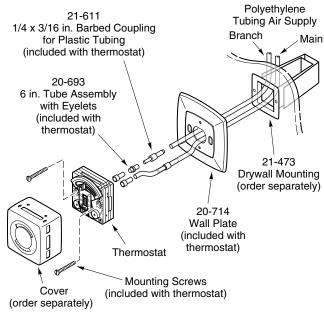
Flush Mounting of Thermostat, Using Drywall Mounting Bracket.
